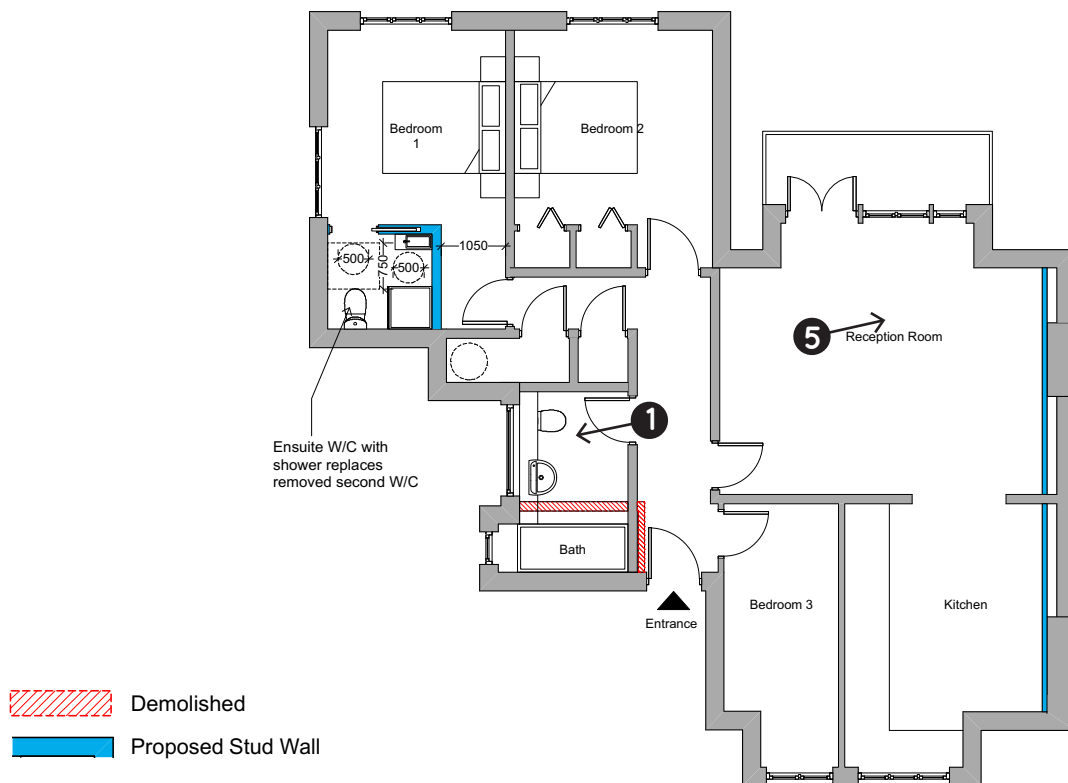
Proposed plan highlighting walls to be removed in red and proposed walls in blue
